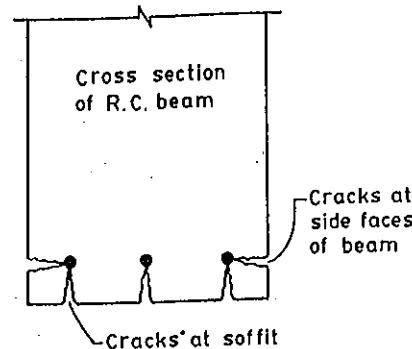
Typical Crack Pattern due to Failure of Bond Between Concrete and Steel
